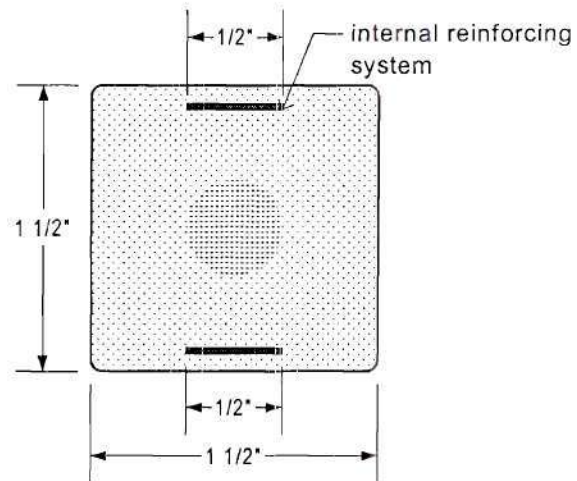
HDPE specimen with E-glass internal reinforcing system
